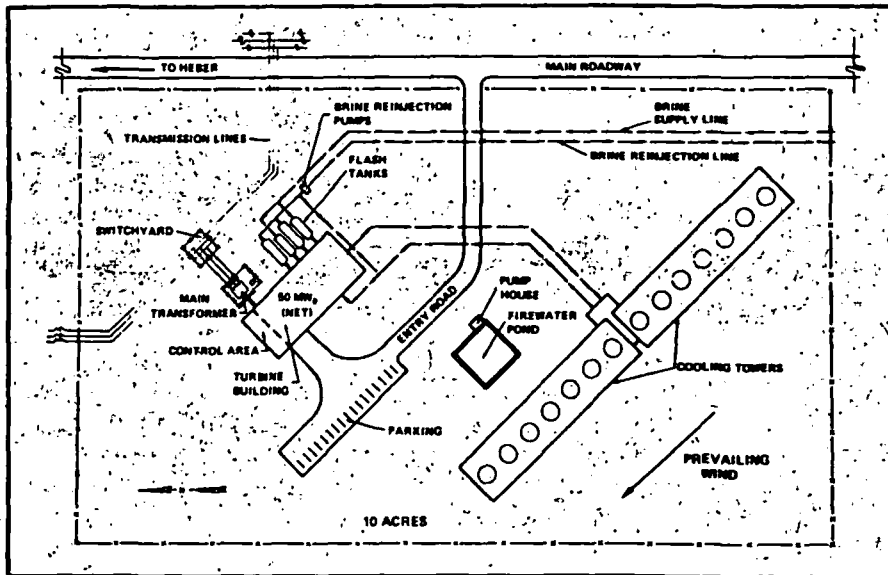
Plot plan of 50-MW flashed-steam power plant.
